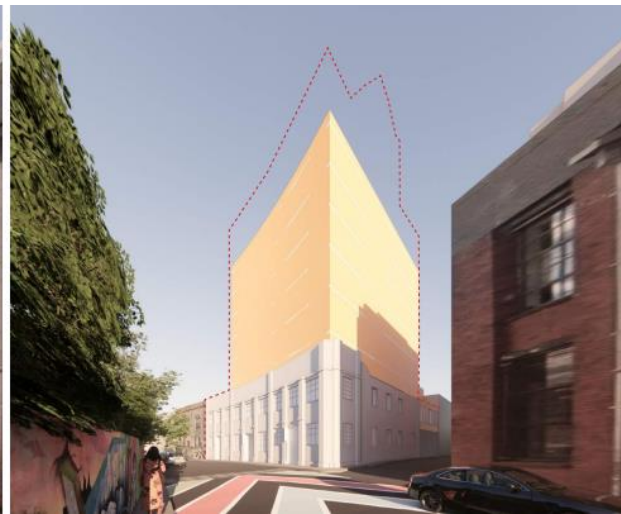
VCAT Proposal – NW view to site from Stewart St Figure 2: DFP Proposal - NW view to site from Stewart St
